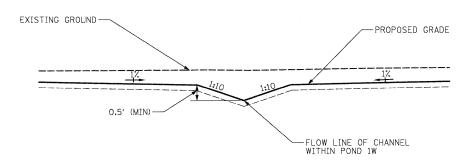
DETAIL A CHANNEL THROUGH BED ROCK- POND 1W NOT TO SCALE
